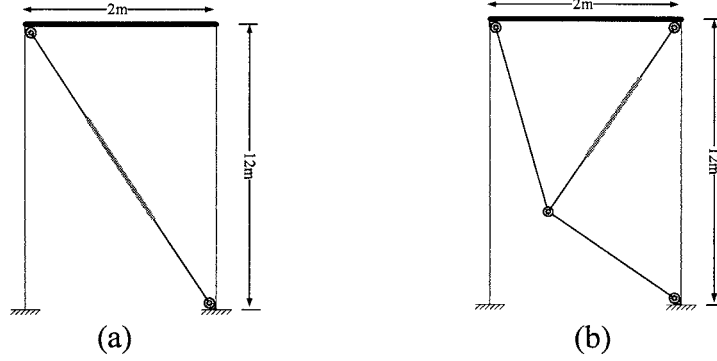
Frame structure with brace damper subject to earthquake excitation: (a) diagonal brace-damper system; and (b) upper toggle brace damper system.
